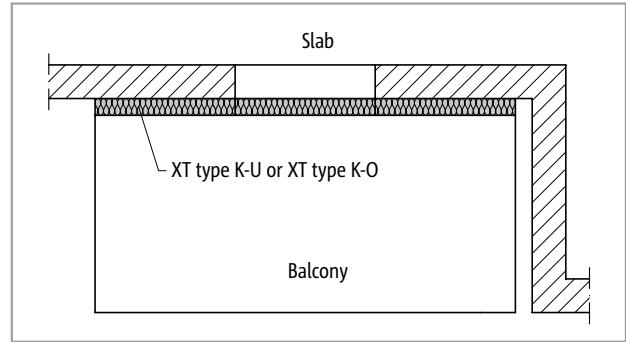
Schöck Isokorb® XT type K-U/K-O: Balcony with facade offset
